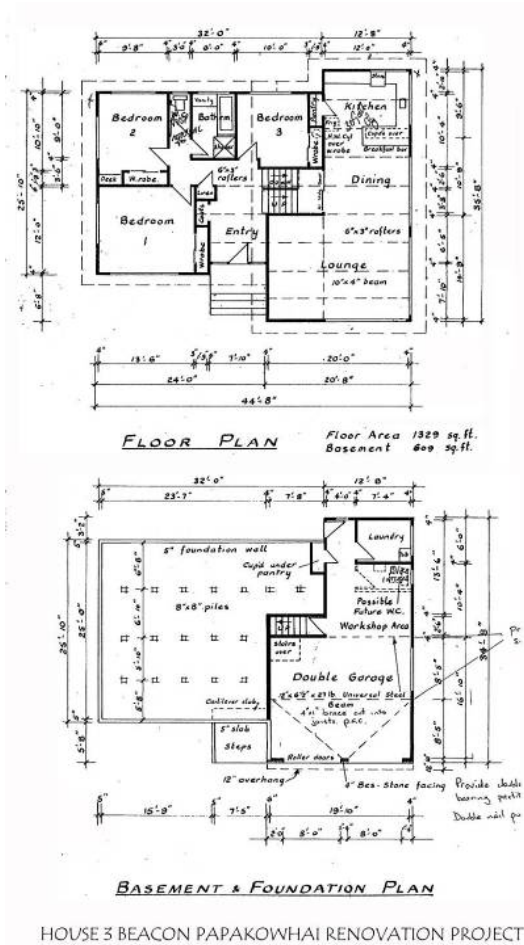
P03 Floor Plan (note that the office extension is not shown in this picture).
